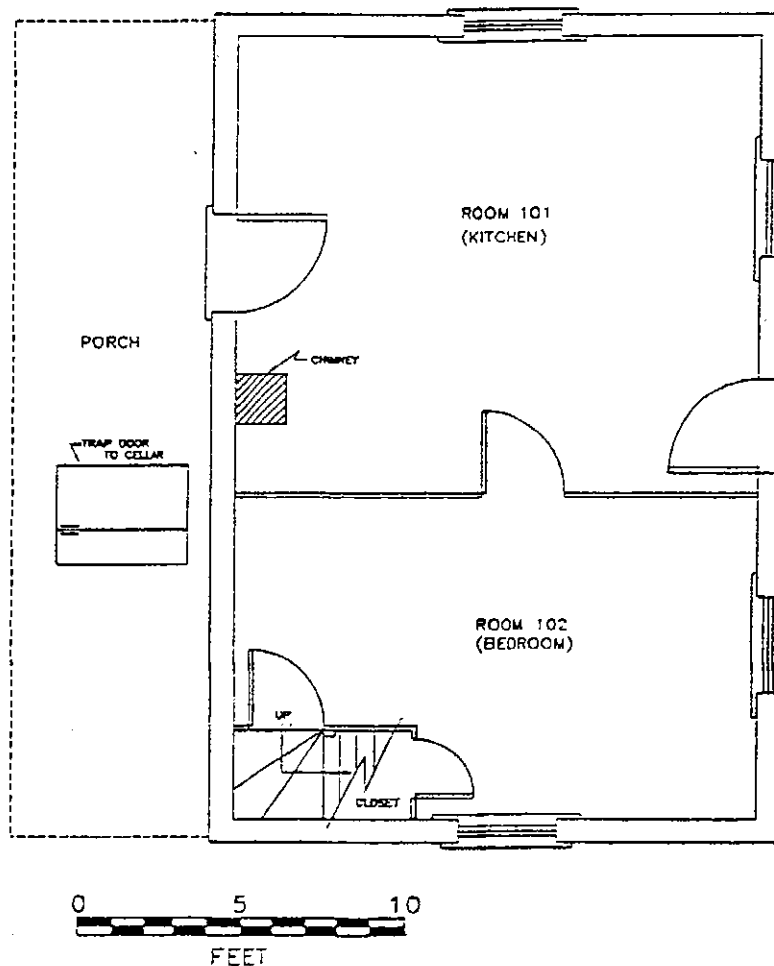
Ground floor plan of Kiel House, ca. 1865.
